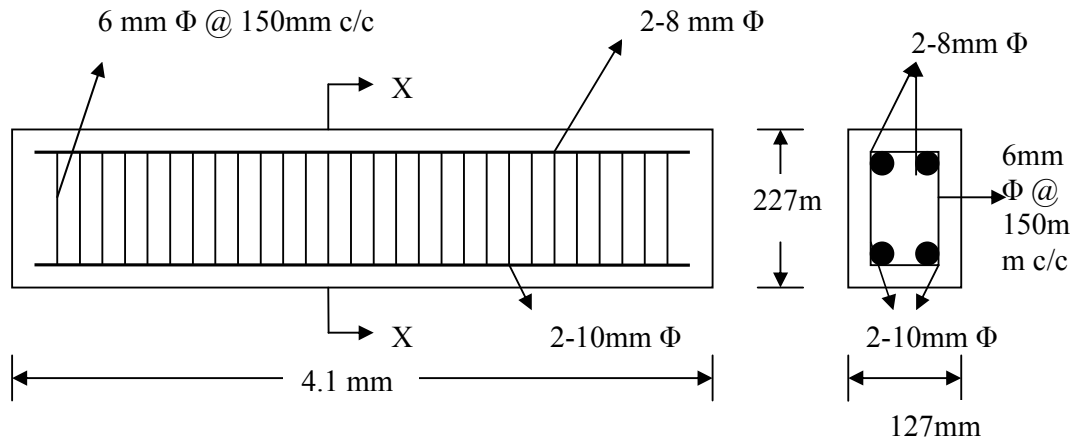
Longitudinal and Cross-Section of Unretrofitted Beam
